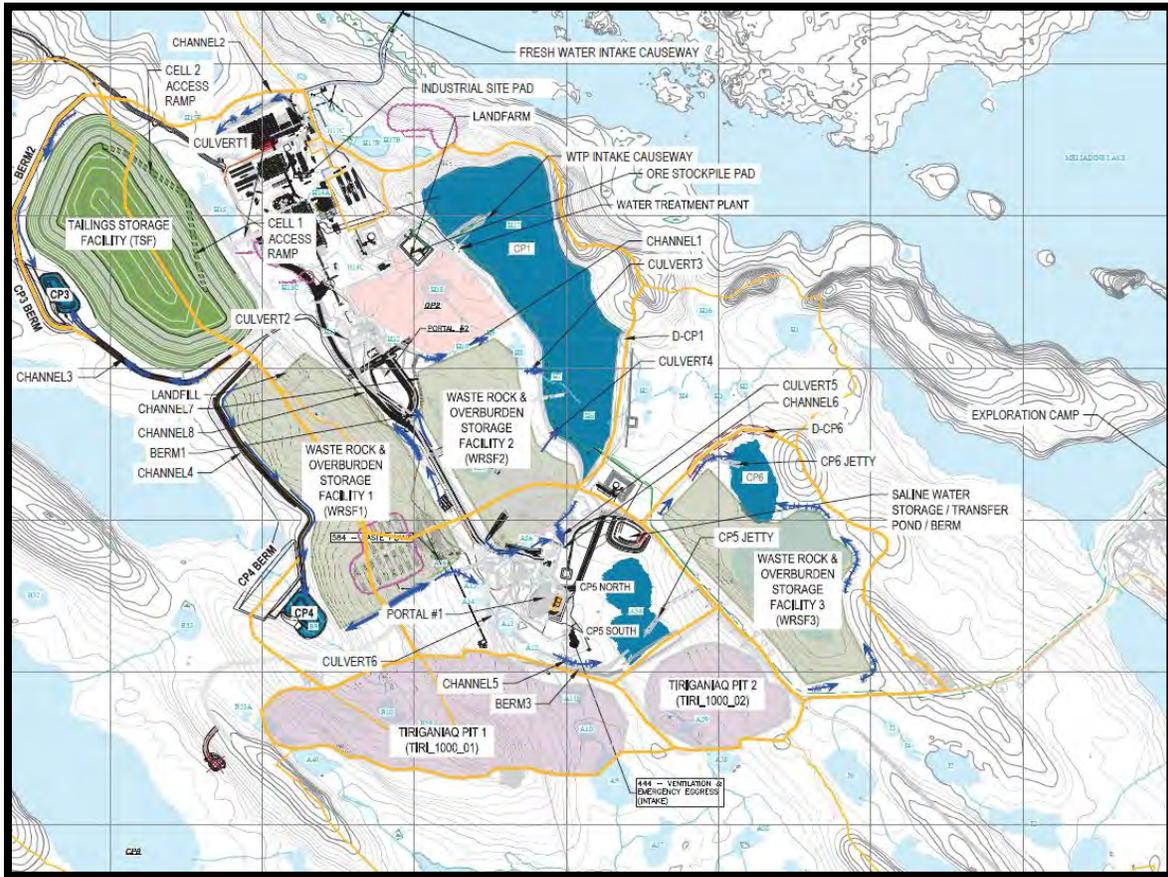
Overview and Site-layout - Meliadine Gold Mine Project
